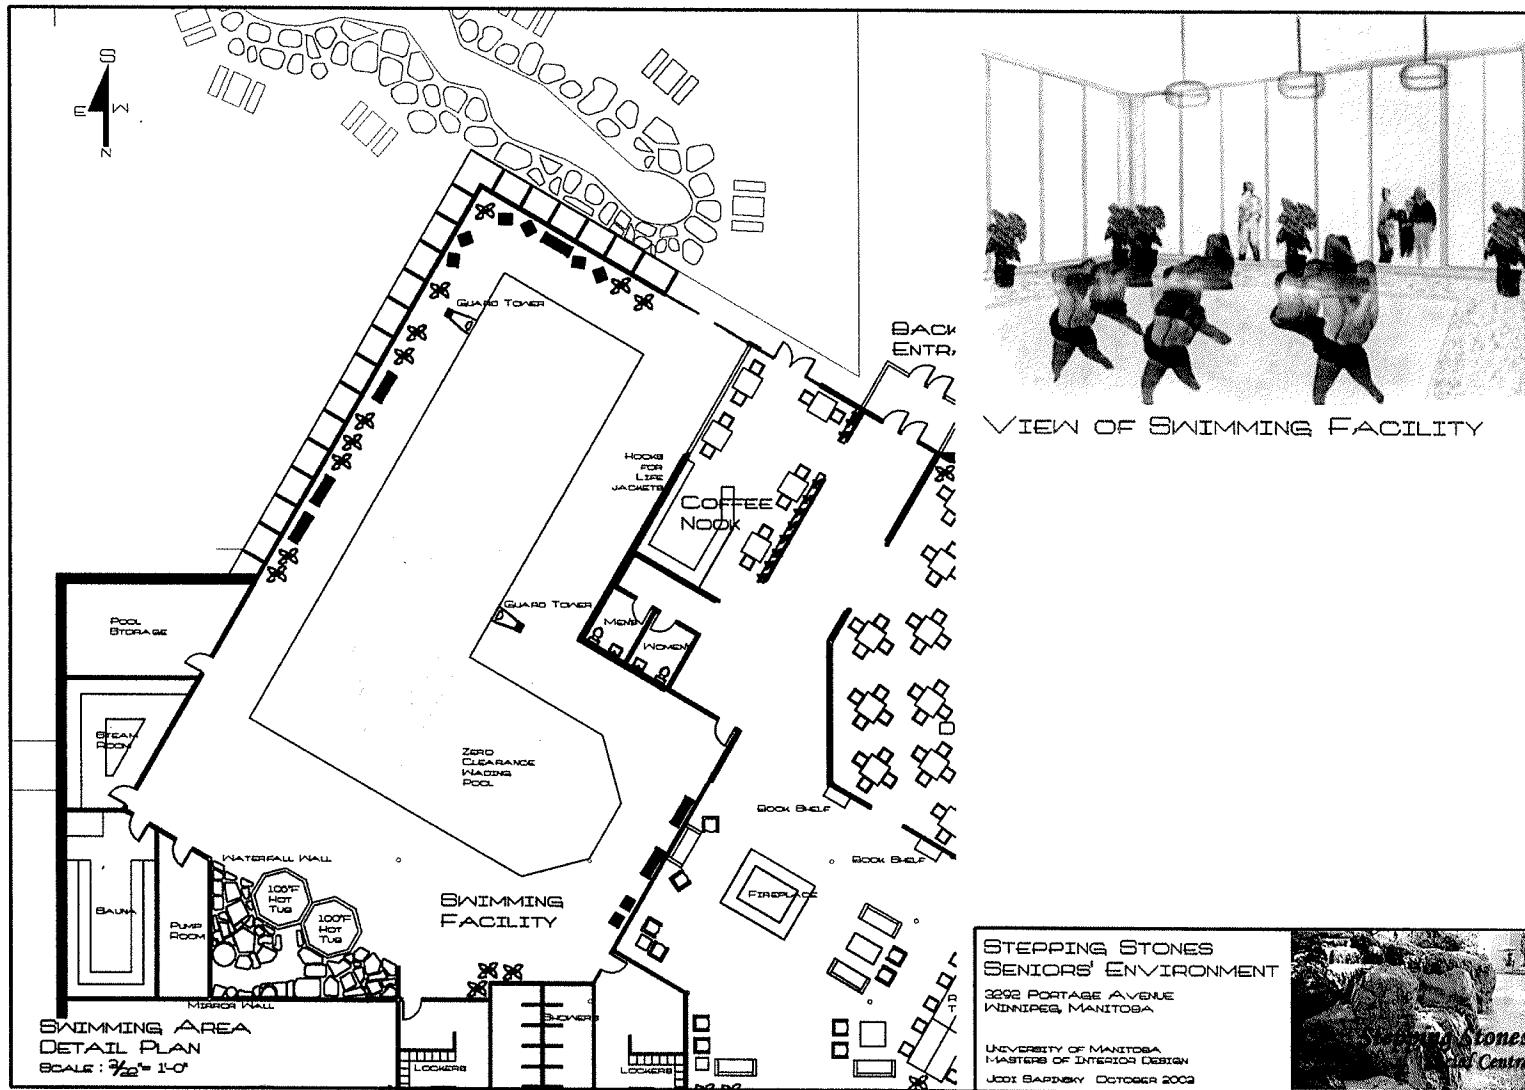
Swimming Area Detail Plan *Jodi Sapinsky
